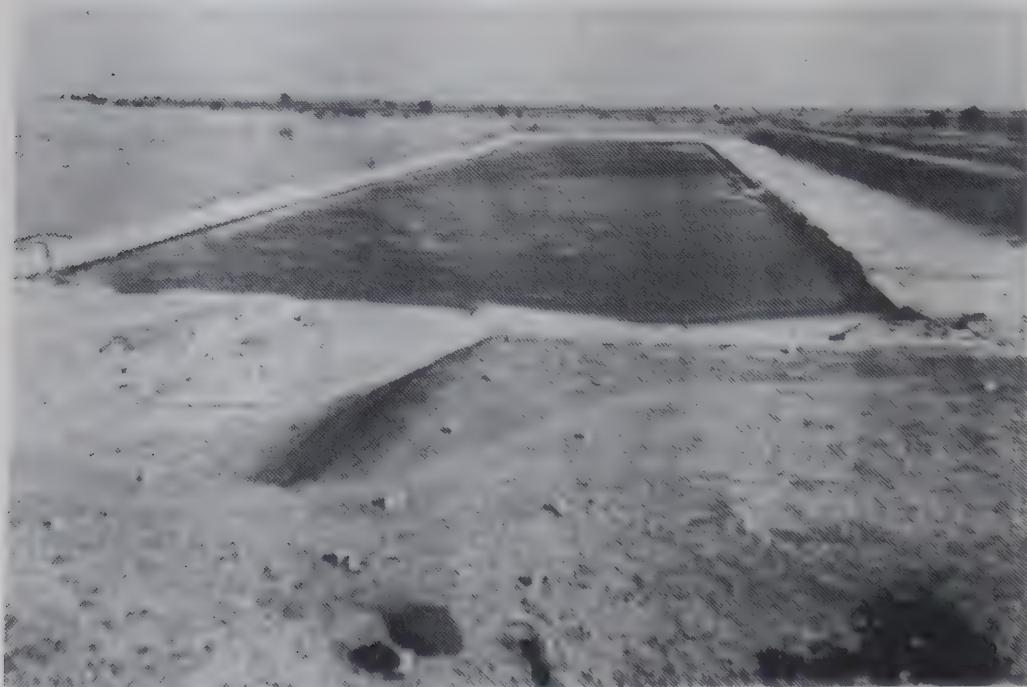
Lothal: Tidal dock with outlet (spill way) in the foreground.
